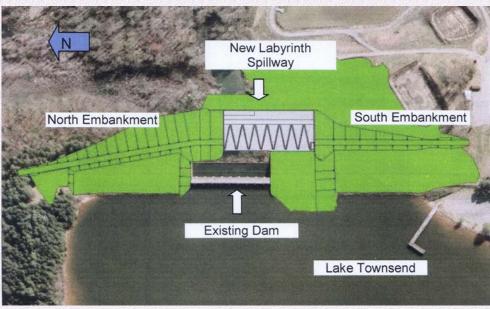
Layout of new dam and labyrinth spillway. Once the new dam is completed, the existing spillway and excess embankment will be removed.
